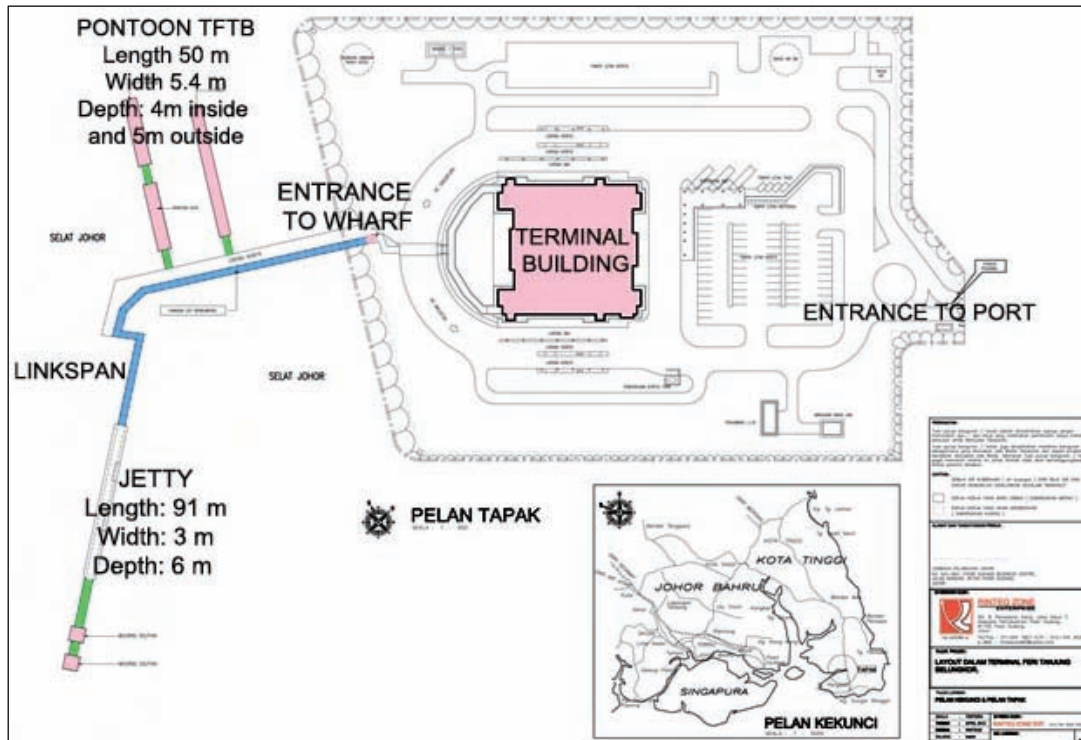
Layout of Tanjung Belungkor Ferry Terminal
